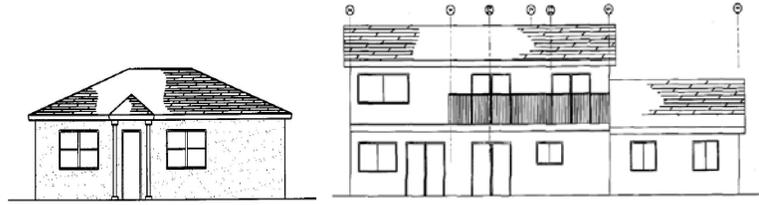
Elevation of the small dwelling, S₁ and S₂ (left) and of the large dwelling, L₁ and L₂ (right) taken from Isoda *et al.* (2001). The foundations below these elevations are explained in
